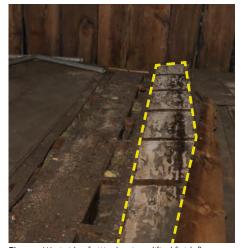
West side of attic showing a lifted finish floor board (yellow) with whitewash on its underside, indicating it was reused from another building. Whether it was installed later is not known.
